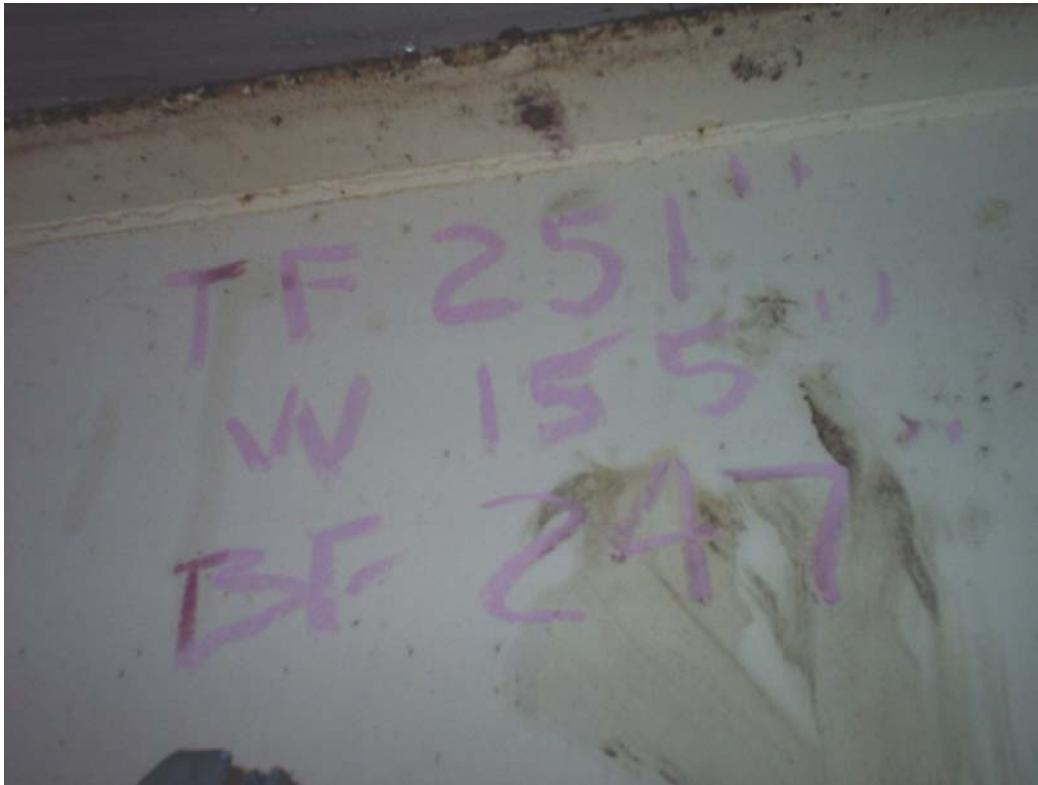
PHOTO OF ROOF GIRDER EVALUATION ACTIVITY.
